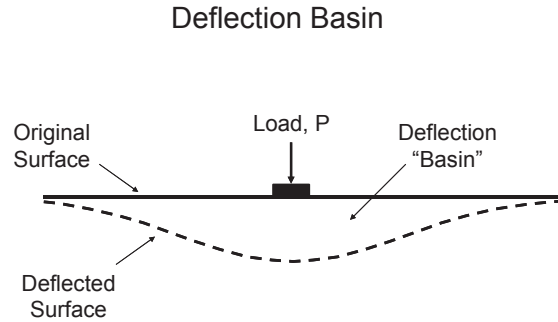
Typical Pavement Deflection Basin (FHWA 2009d)
